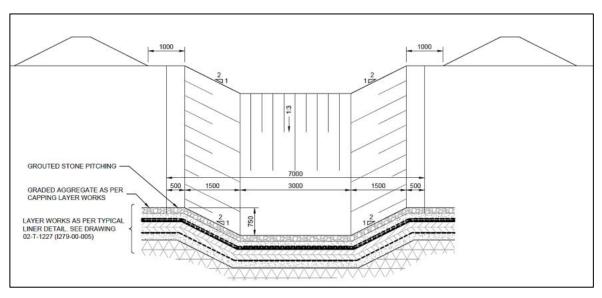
Cross Section of Downchute 1 (Drawing 02-T-1307)
